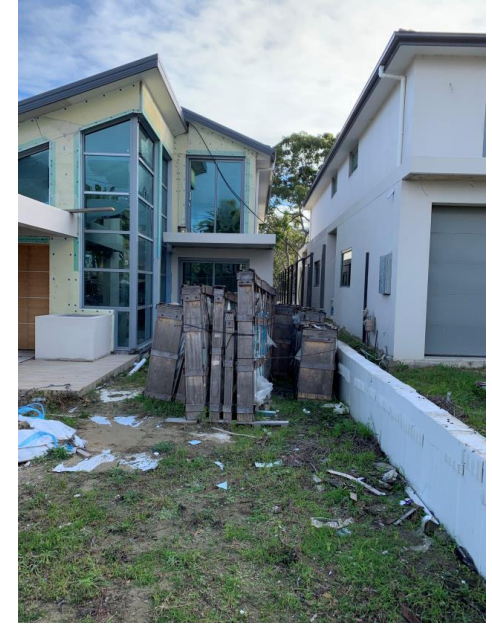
Street view looking south-west at 1178 Forest Road, main dwelling and basement garage containing surface water.
